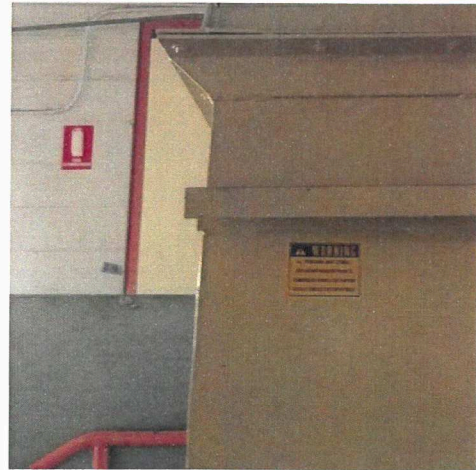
Level 23, Plant Room, Hot Water Unit - Mastic
